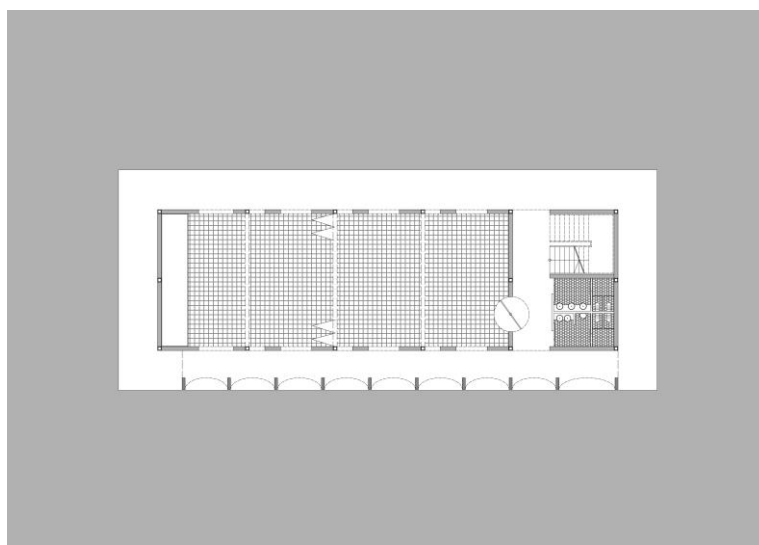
KKU Faculty of Architecture, Textile Workshop. General layout plan © Alexandru Calin
